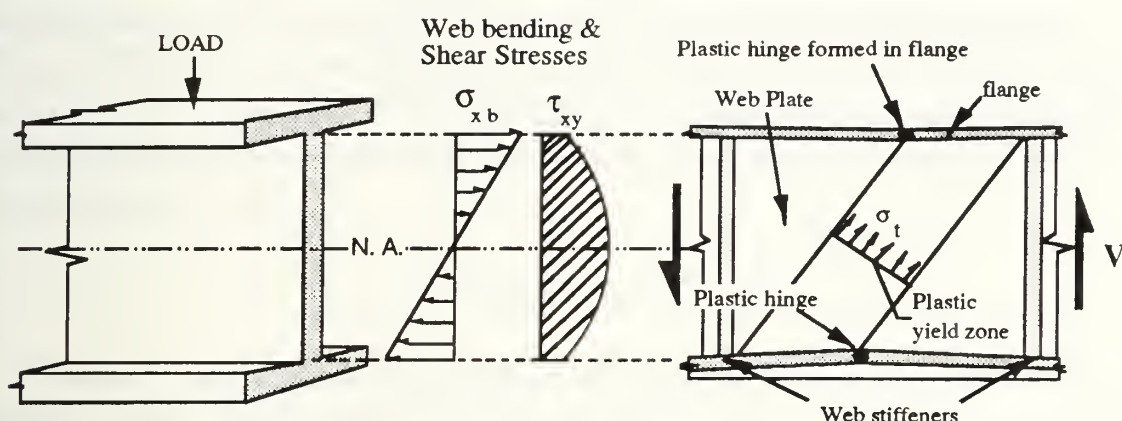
Failure Model for Symmetrical Girder Loaded in Shear
